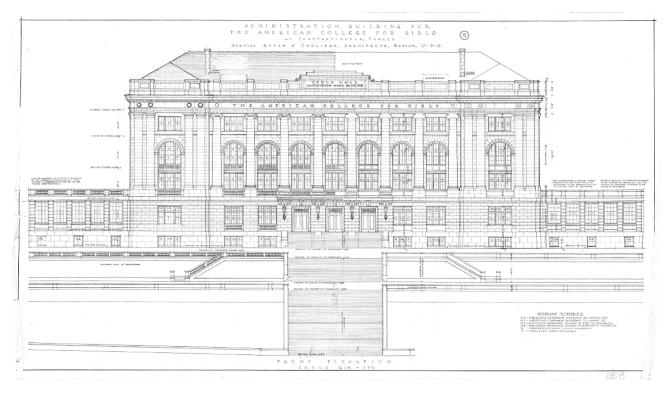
Shepley, Rutan & Coolidge, American College for Girls, Constantinople, drawing ca. 1908, front elevation of Gould Hall (administration building, building 4) (courtesy of Shepley Bulfinch).
